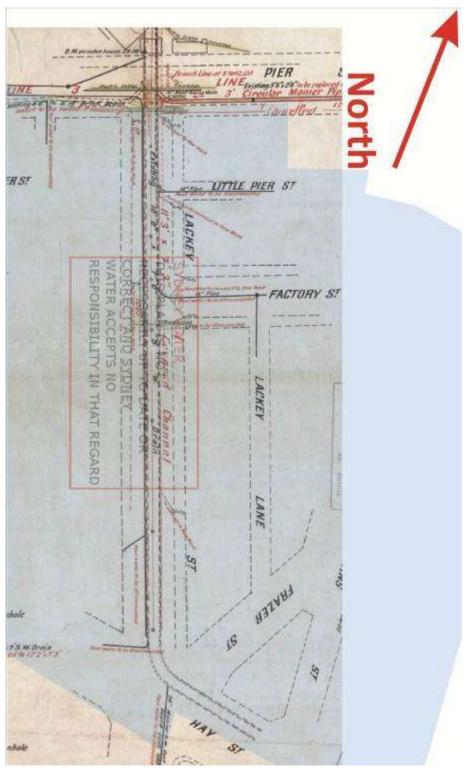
A plan of the proposed enlargement of the Lackey Street section of the Hay Street channel. DL 2614 Sheet 1, 13 Jun 1927, Sydney Water.
